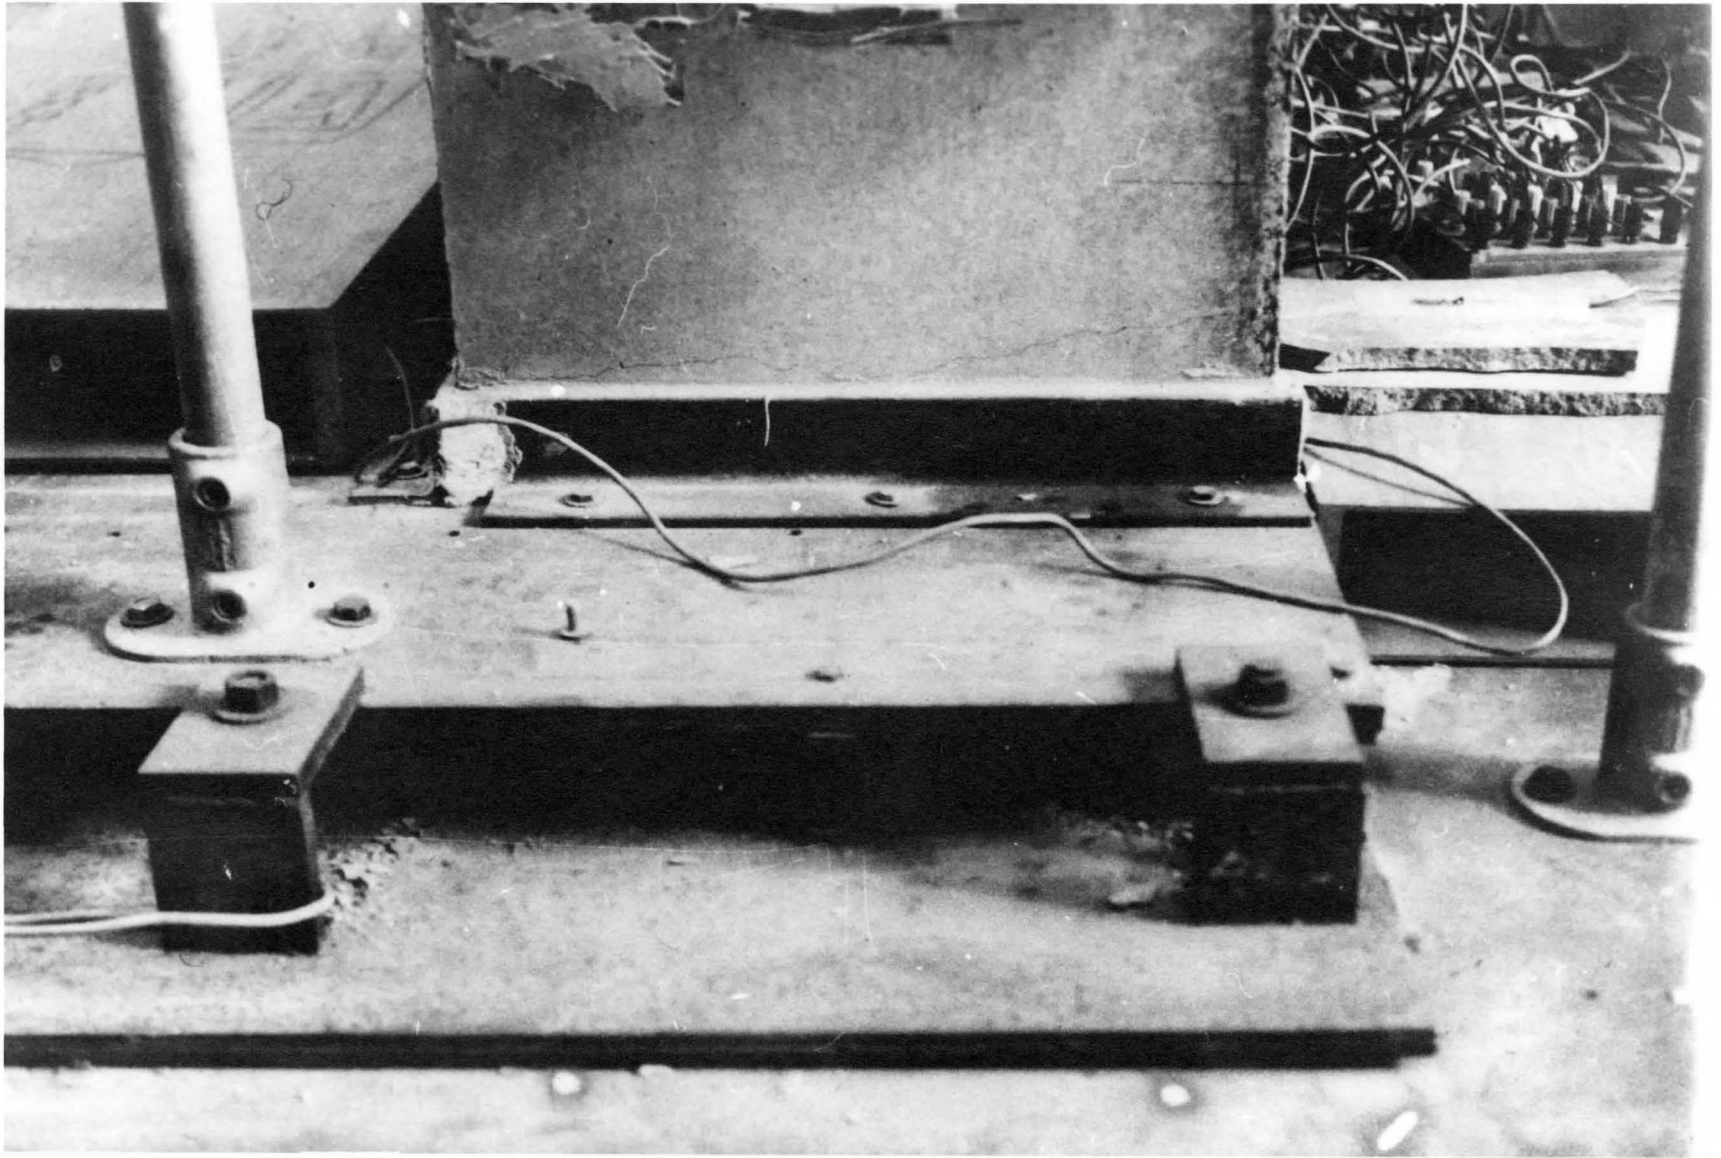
CRACKING PATTERN ALONG FLANGE 3 OF BUILDING 11
